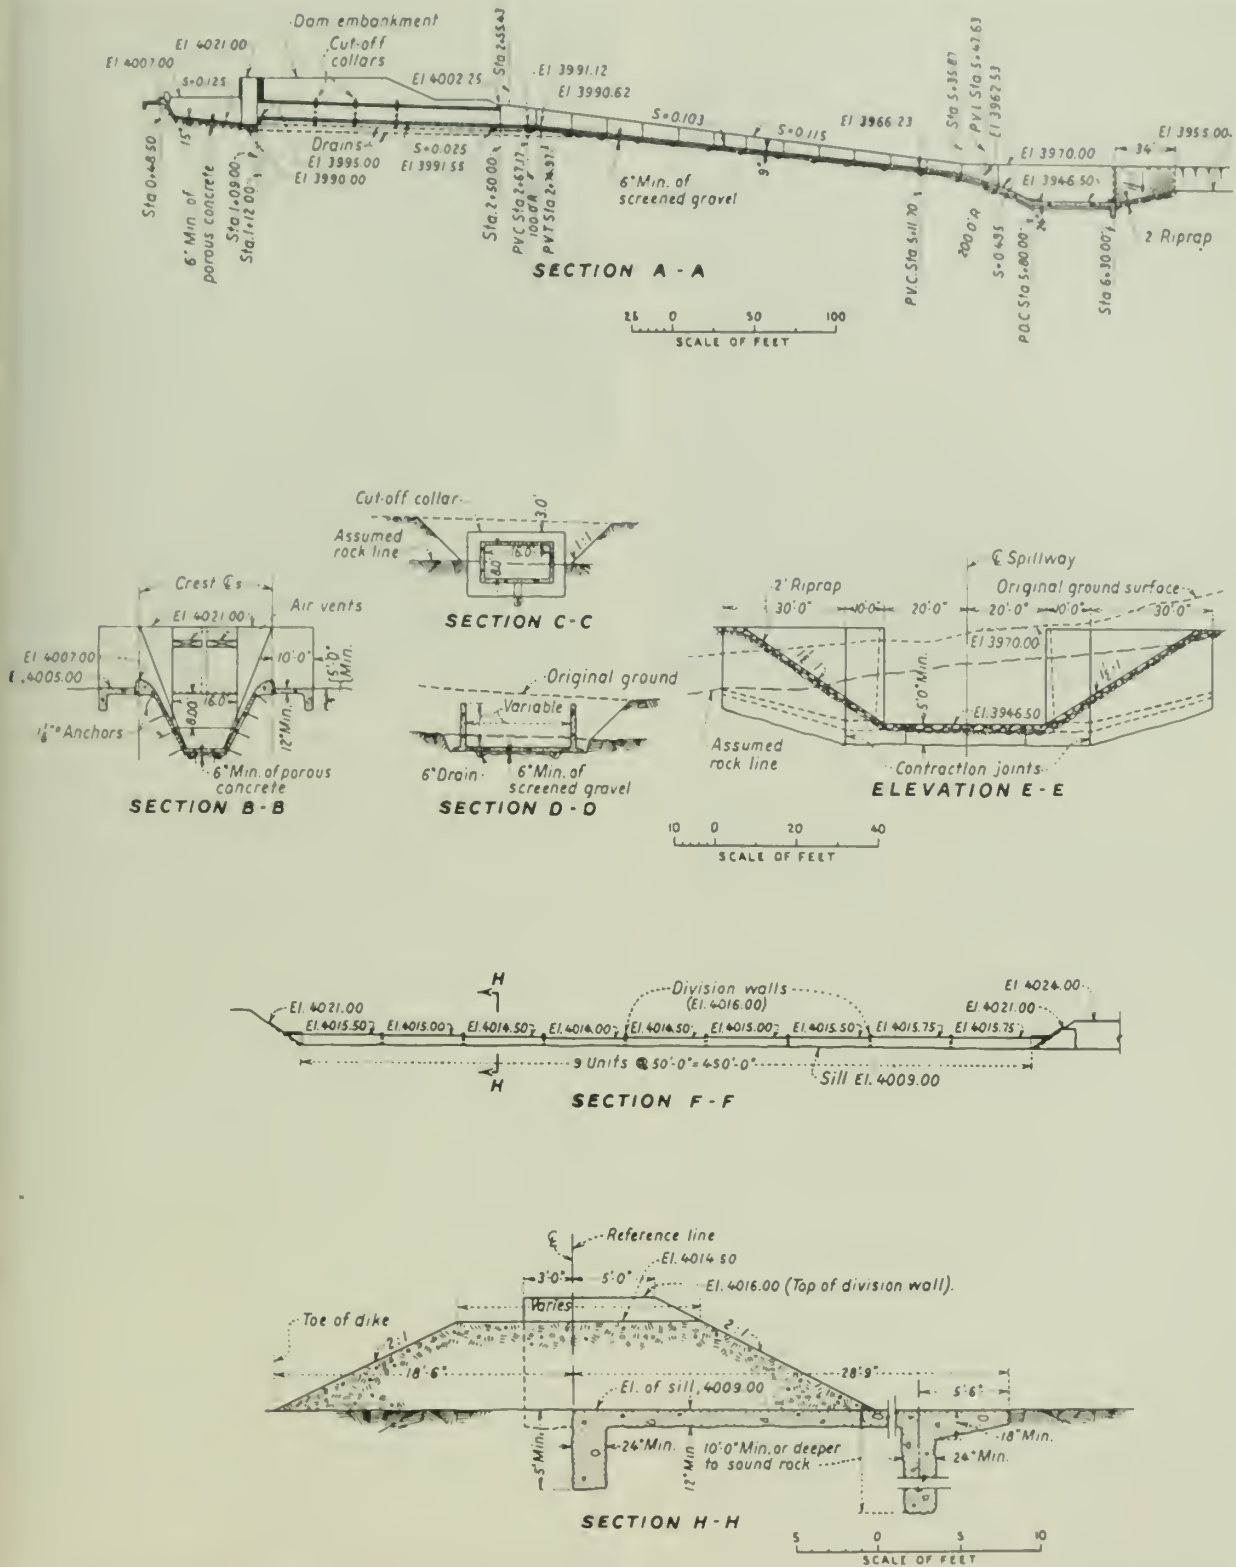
Service and auxiliary spillways for Box Butte Dam—Plan and sections. From drawing 278-D-49. (Sheet 2 of 2.)
